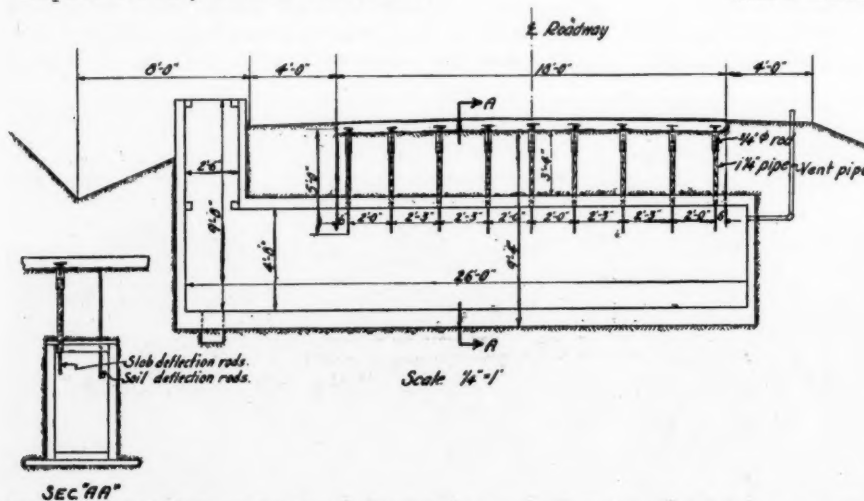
SECTION THROUGH INSPECTION TUNNEL SHOWS DEFLECTION RODS EXTENDING THROUGH PIPE SLEEVES
